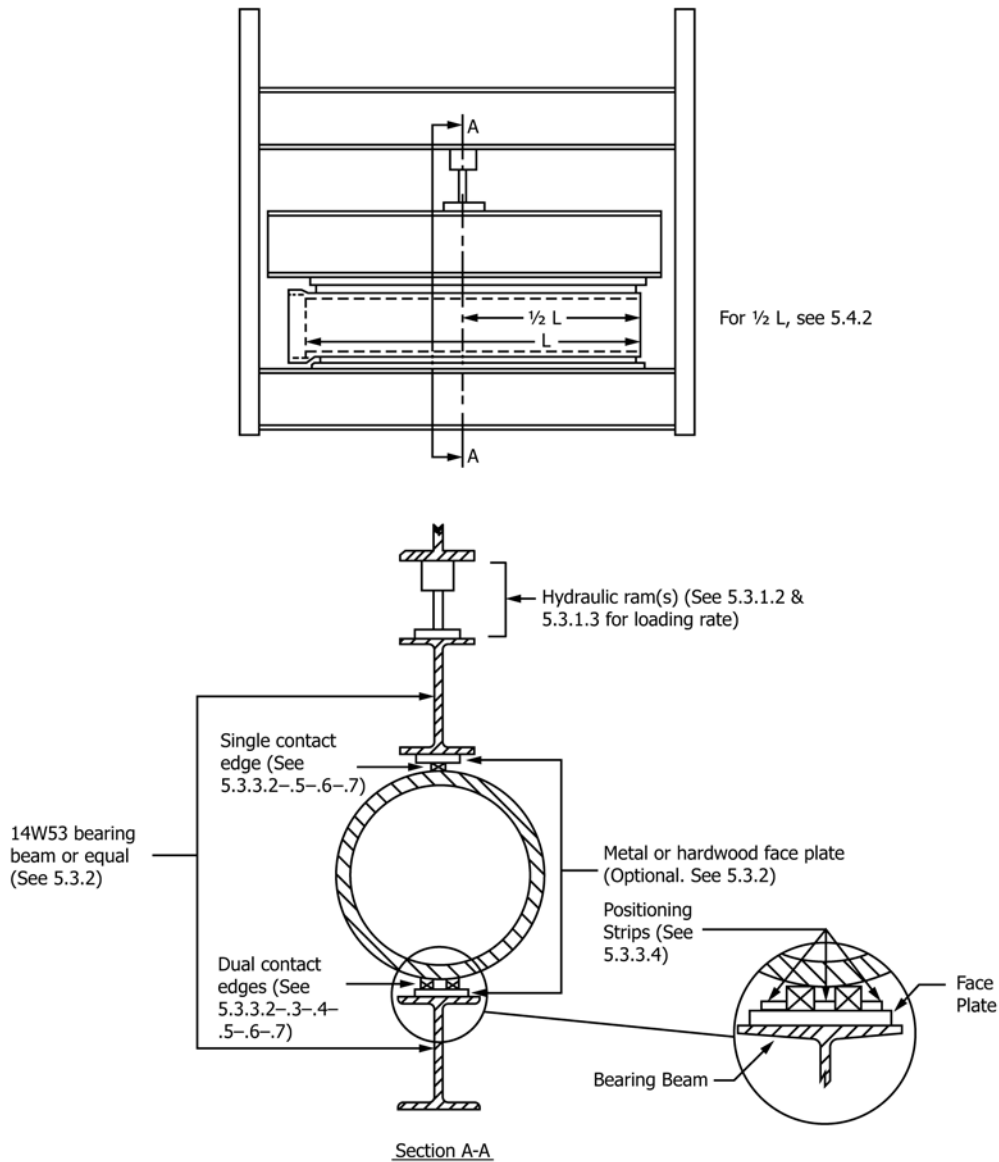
Three-Edge Bearing Testing (see 5.3.4 for Segmented Testing)
